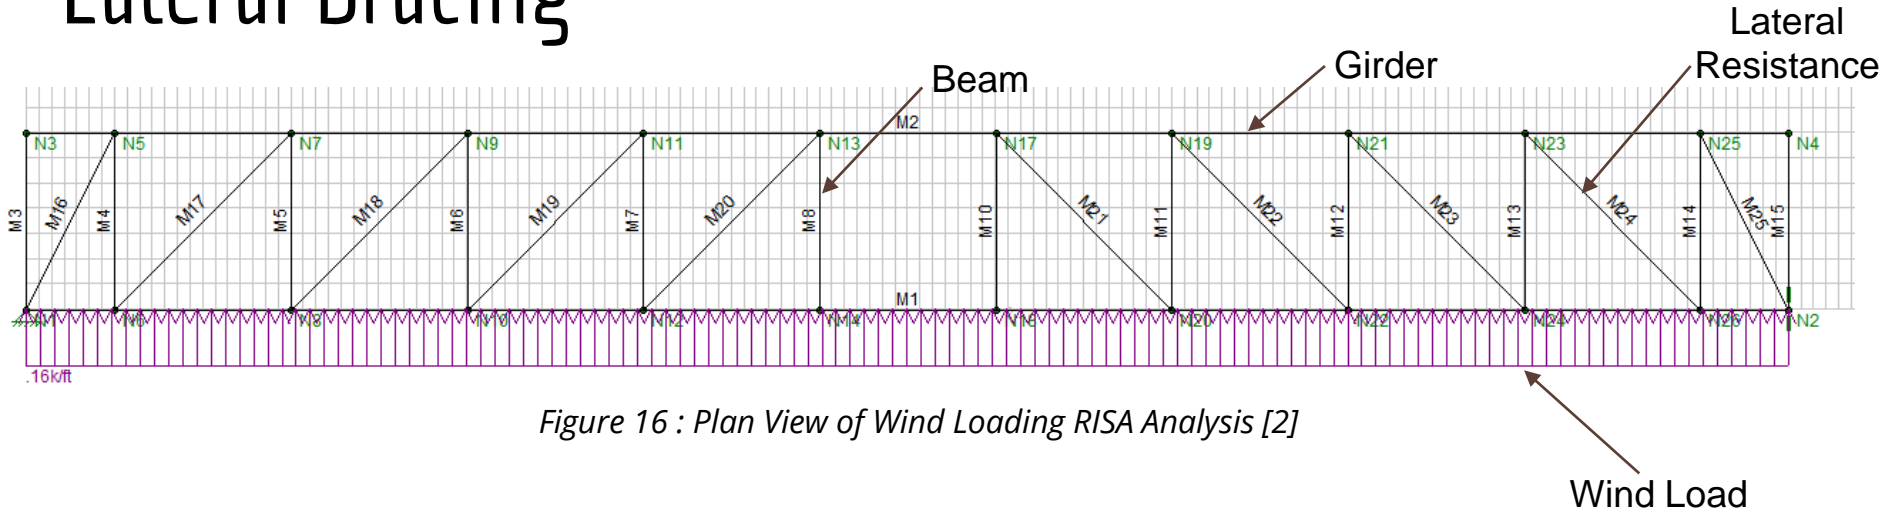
Plan View of Wind Loading RISA Analysis [2]
